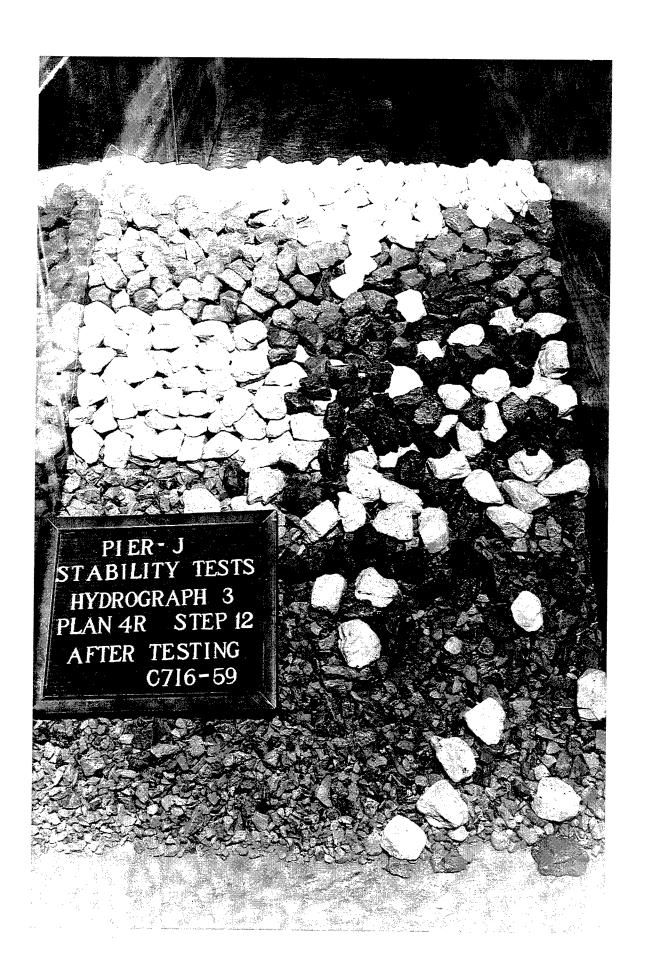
Harbor-side view of Plan 4 at the conclusion of testing
